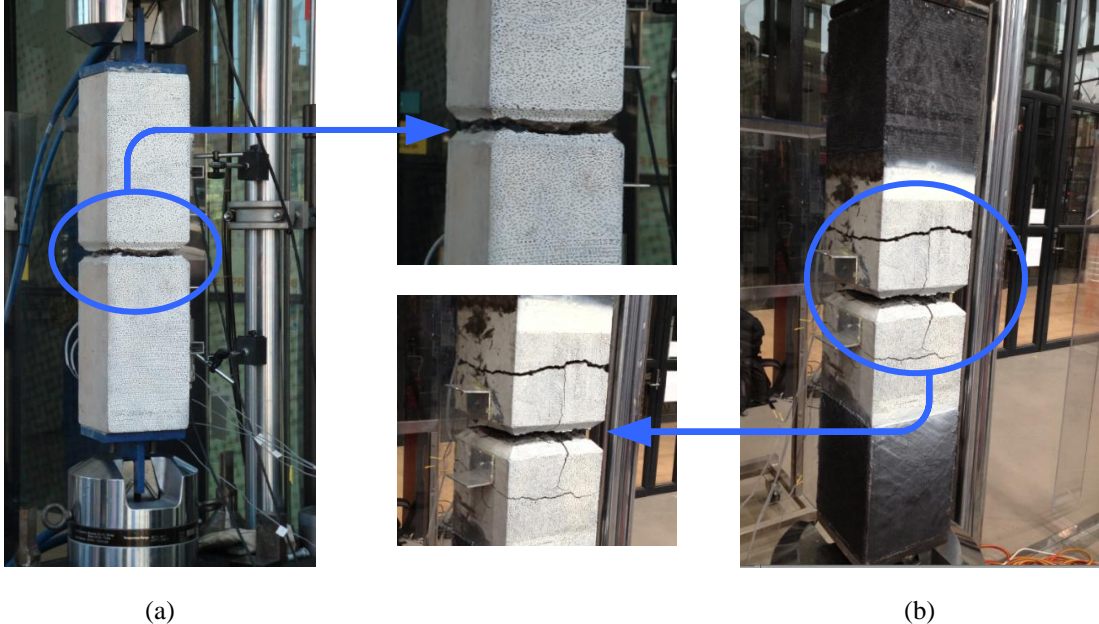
Specimen testing terminated at: (a) bar fracture with a single crack; (b) formation of multiple cracks.
